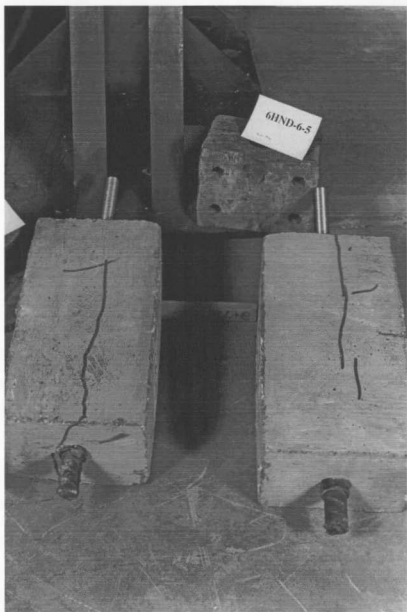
Specimen 6 HND-6-5 after testing and crack pattern
